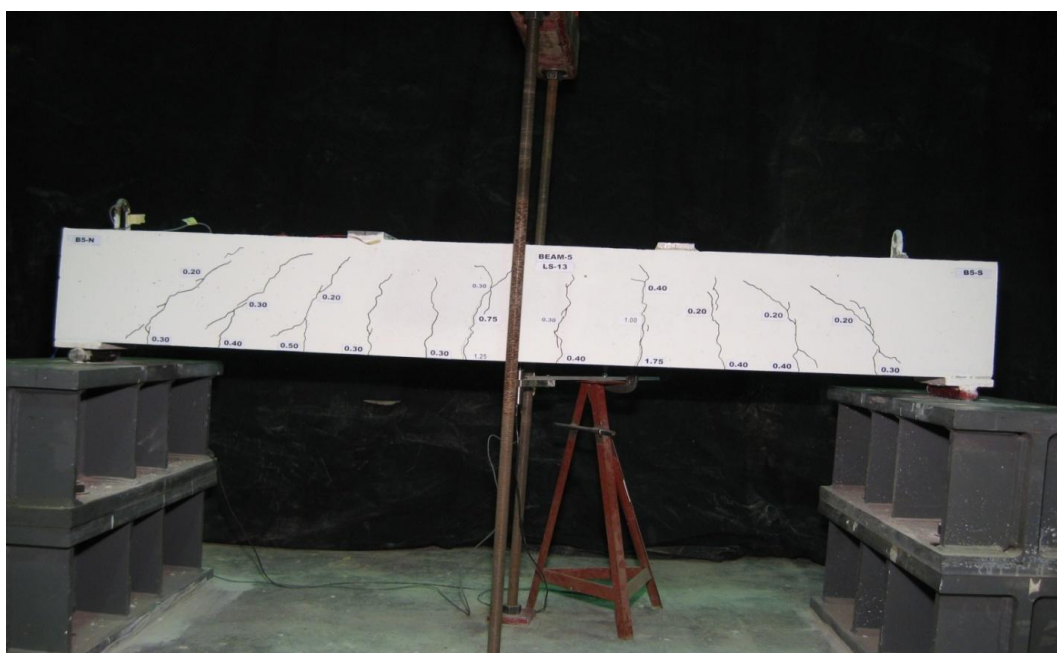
Cracking pattern for beam 5 at a load of 138.49 kN (B5-LS13)
